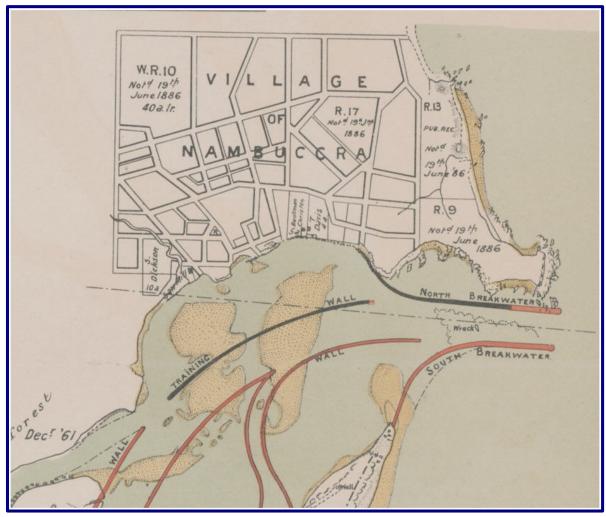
Construction of the Nambucca River Breakwaters Extract from The Department of Public Works Plan of constructed (black) and proposed works (red) for the Nambucca River breakwaters and training walls – 30 June 1902.
